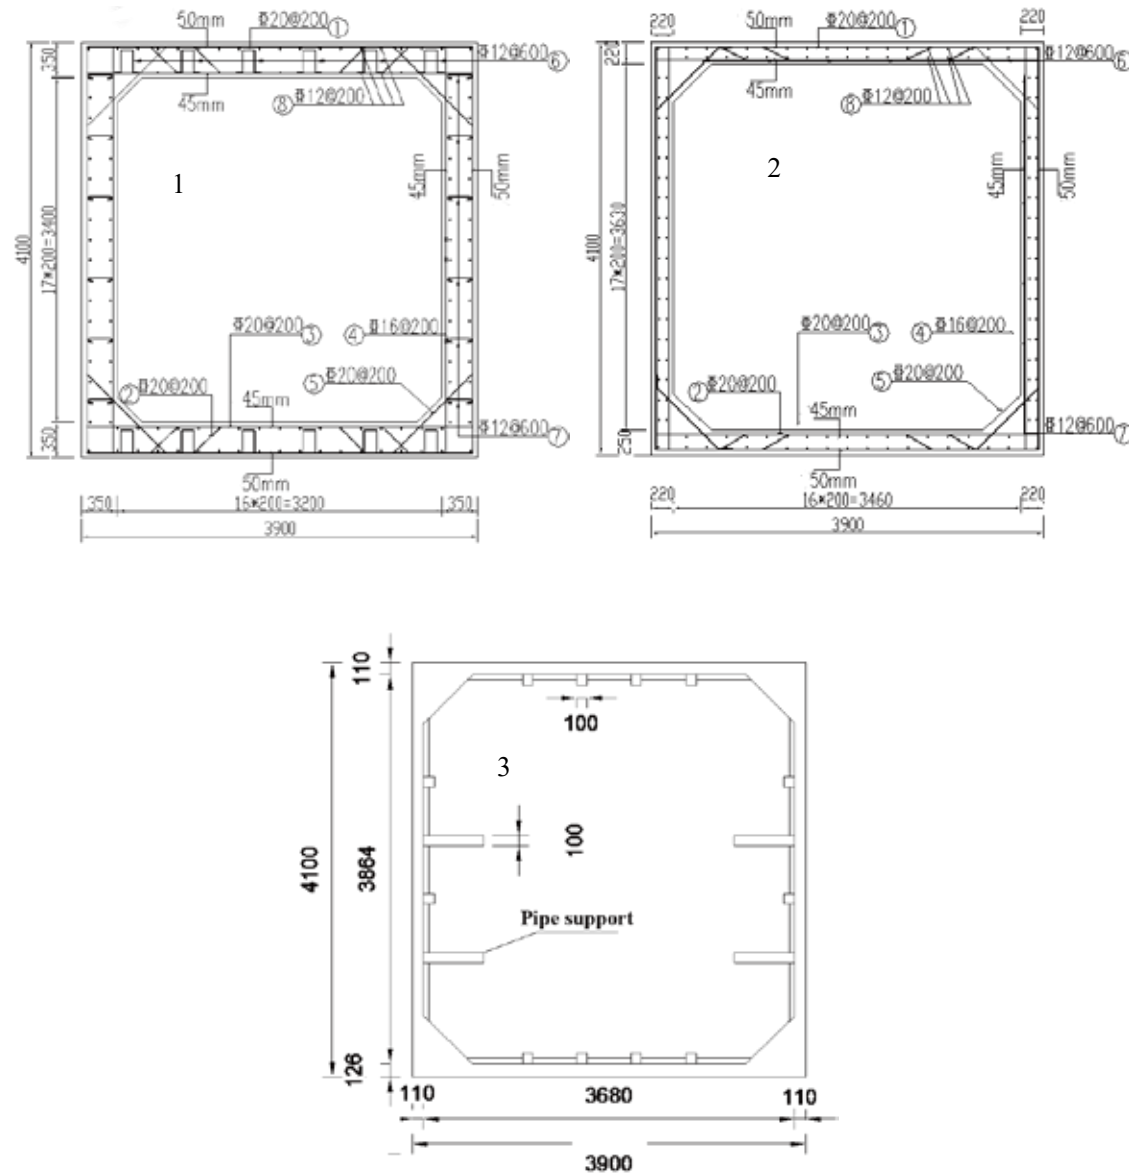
Standard section size and reinforcement drawing of utility tunnel; Fig.2 Standard section size and reinforcement drawing of UHPC utility tunnel; Fig. 3 Optimal structure diagram of utility tunnel
